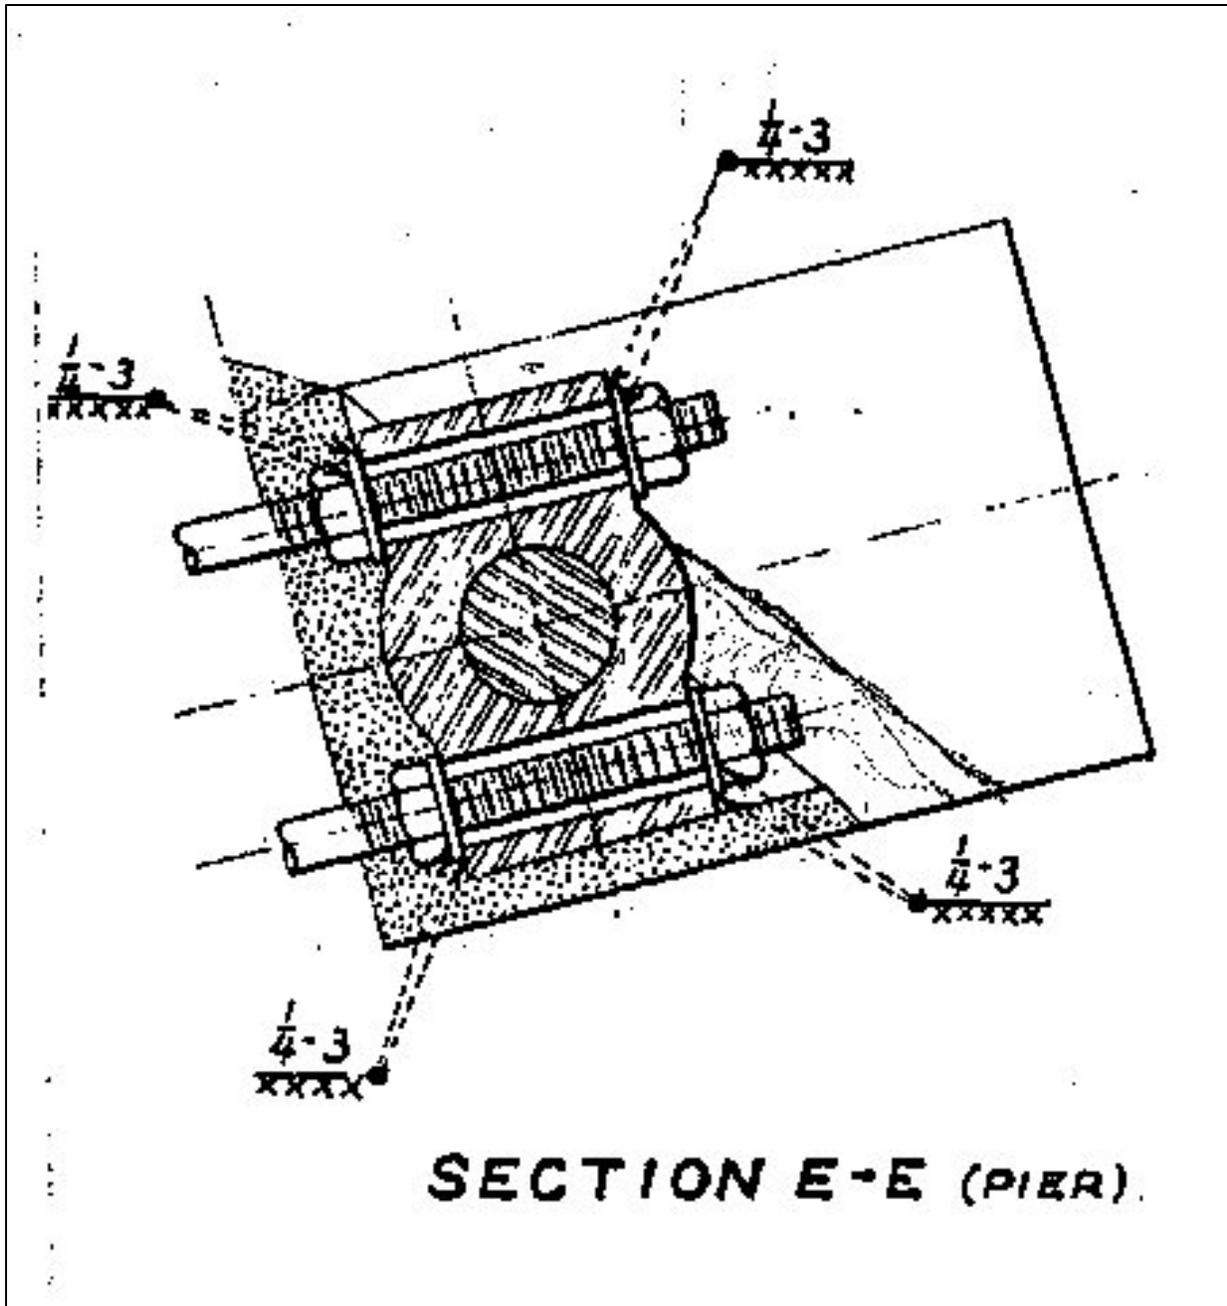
This cross-section drawing shows how the hinge pin bearing is anchored into the pier wall. Only one of the six anchor bolts is exposed, the others are completely buried in the concrete.
